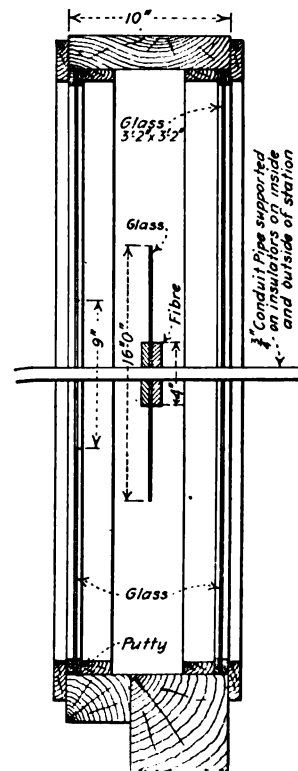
WASHINGTON WATER POWER CO. DETAIL OF WALL ENTRANCE FOR HIGH-TENSION LINE, ODESSA SUBSTATION
